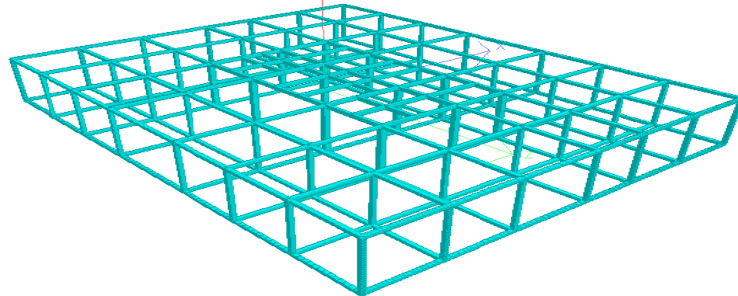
BUOYANCY TANK (using concrete hollow structure)
